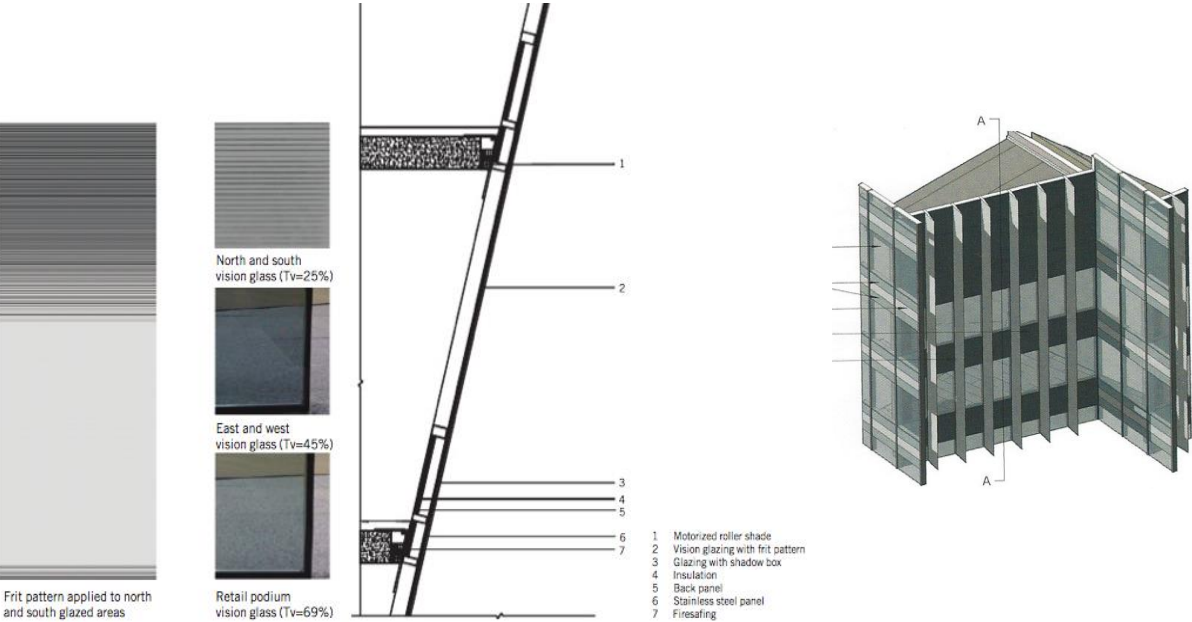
Three glass types and the graduated frit pattern used on the north and south facade glazing. (on the left) Glass selection for different facade orientations; (on the right) Partial south facade curtain wall section.
